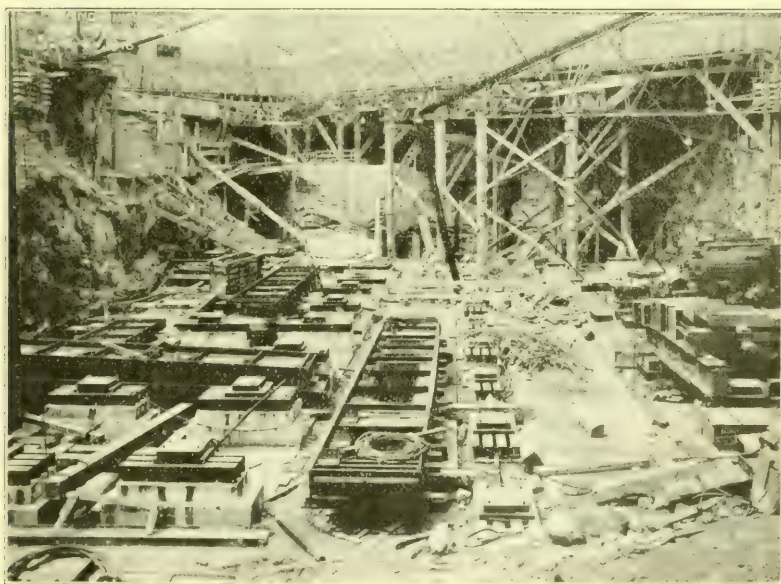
FLOOR OF DIAGONAL STATION, LARGE GIRDERS FOR EXPRESS TUNNEL LYING ON THE FLOOR.
